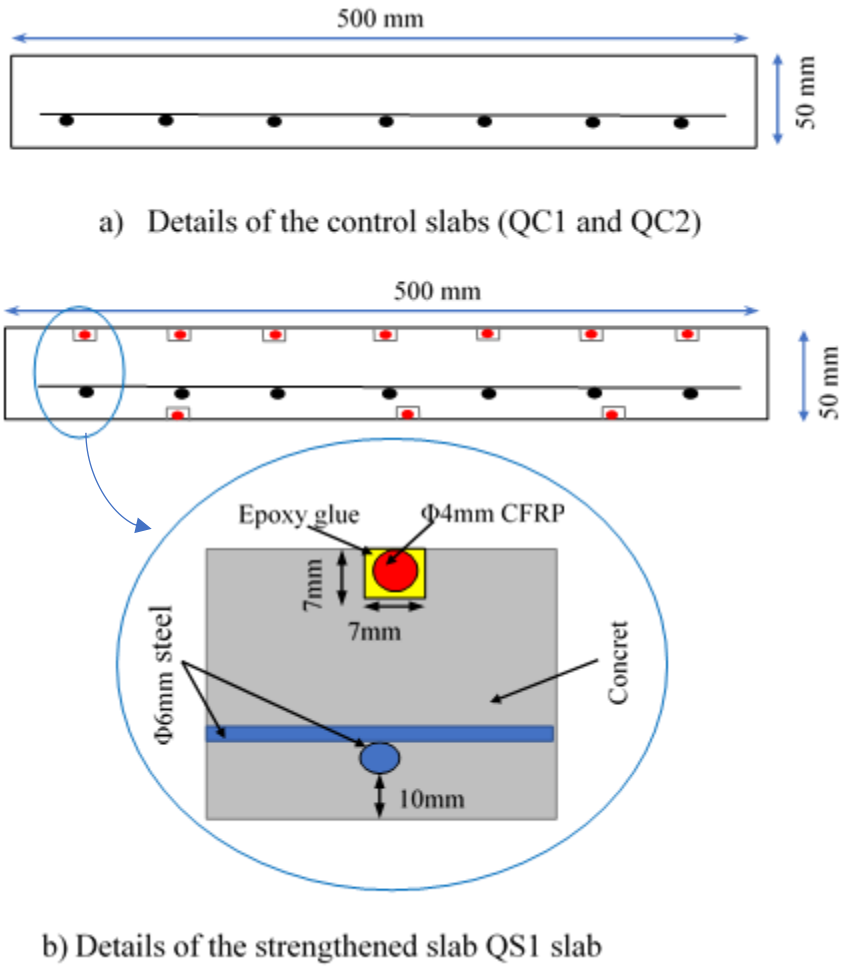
Details of the internal and the external reinforcement in the cross-section of the test slabs.
